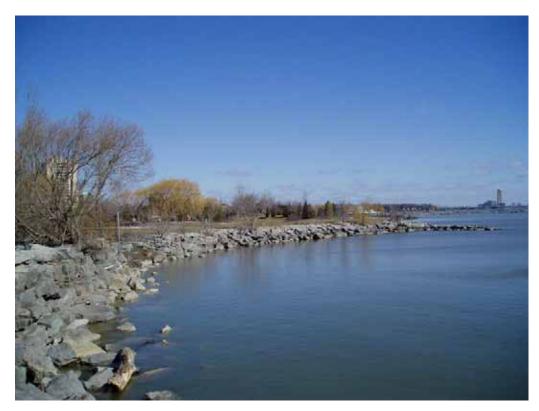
J.C. Saddington – Dumped armourstone at western limit of park
